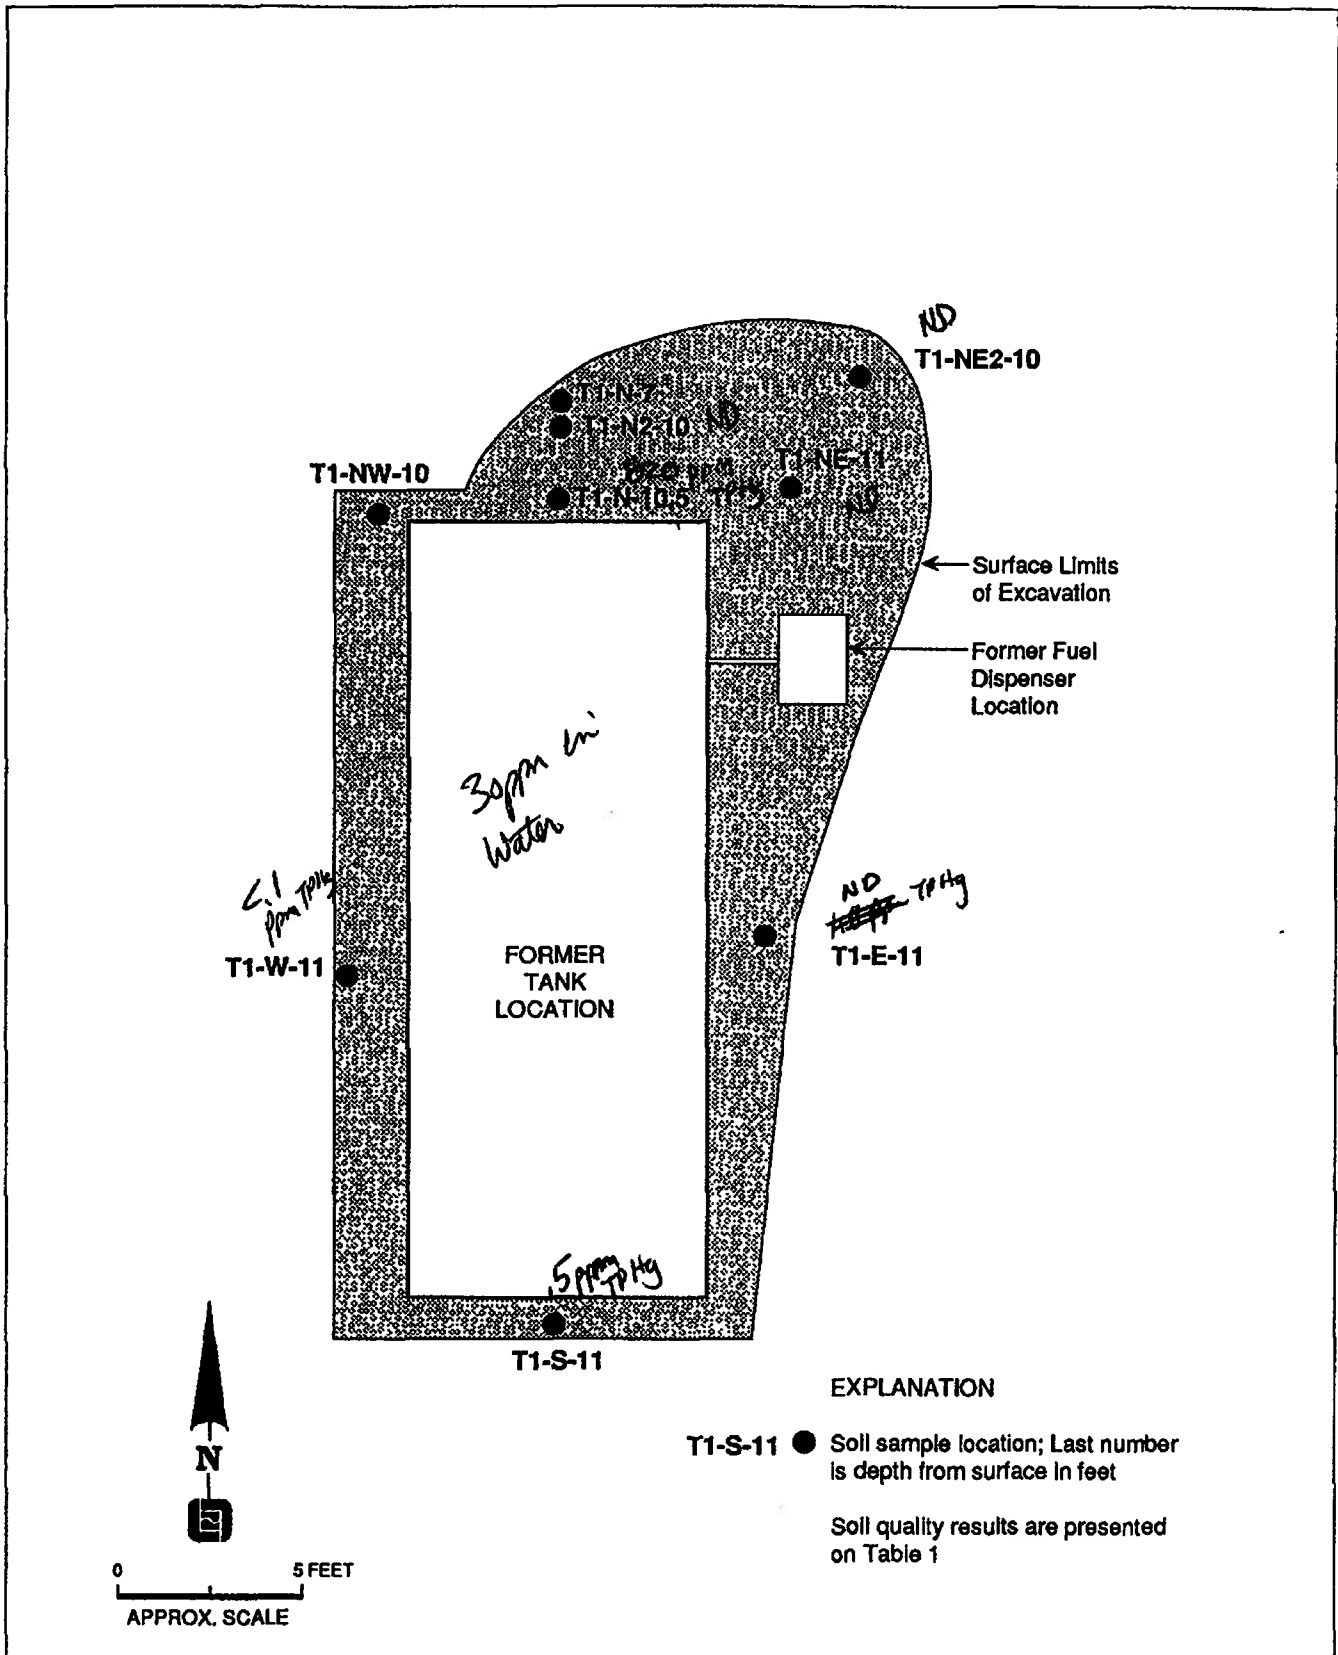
PLAN SHOWING SOIL SAMPLE LOCATIONS
